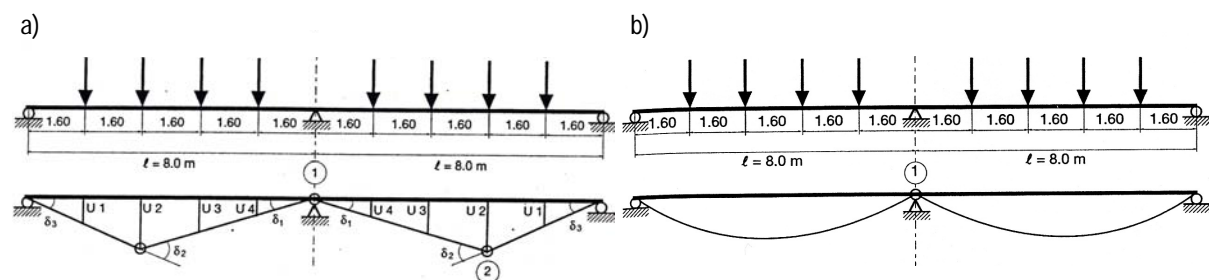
Static system and failure mechanism of concrete beams with (a) steel strands: first plastic hinge forms over the mid-support and second in the right-hand span, (b) CFRP strands: an elastic hinge forms over the mid-support (Maissen 2000)
